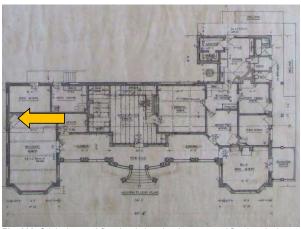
Original ground-floor level plan showing proposed fireplace in the Billiard Room.
